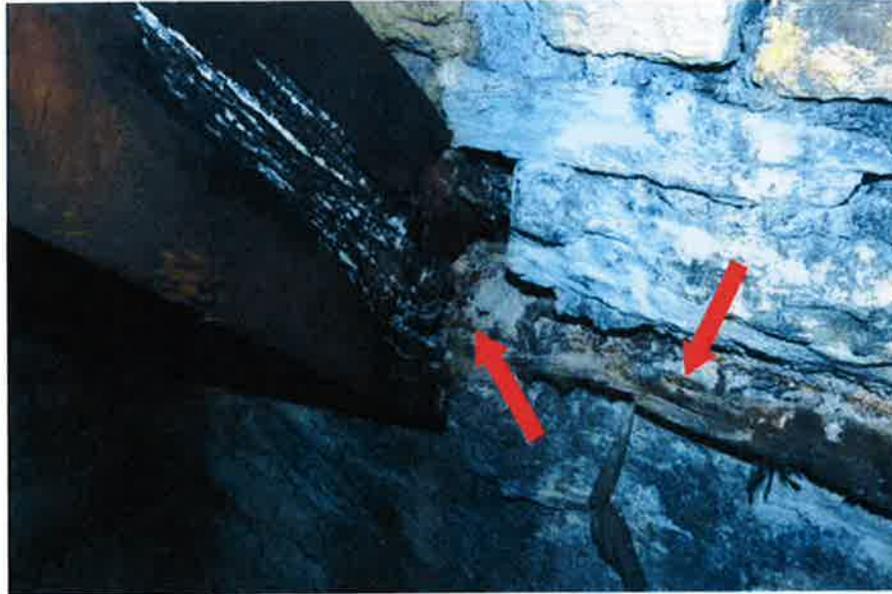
Deterioration and rot of several rafters and wood bearing plates embedded within the limestone wall were observed near this leak location.
